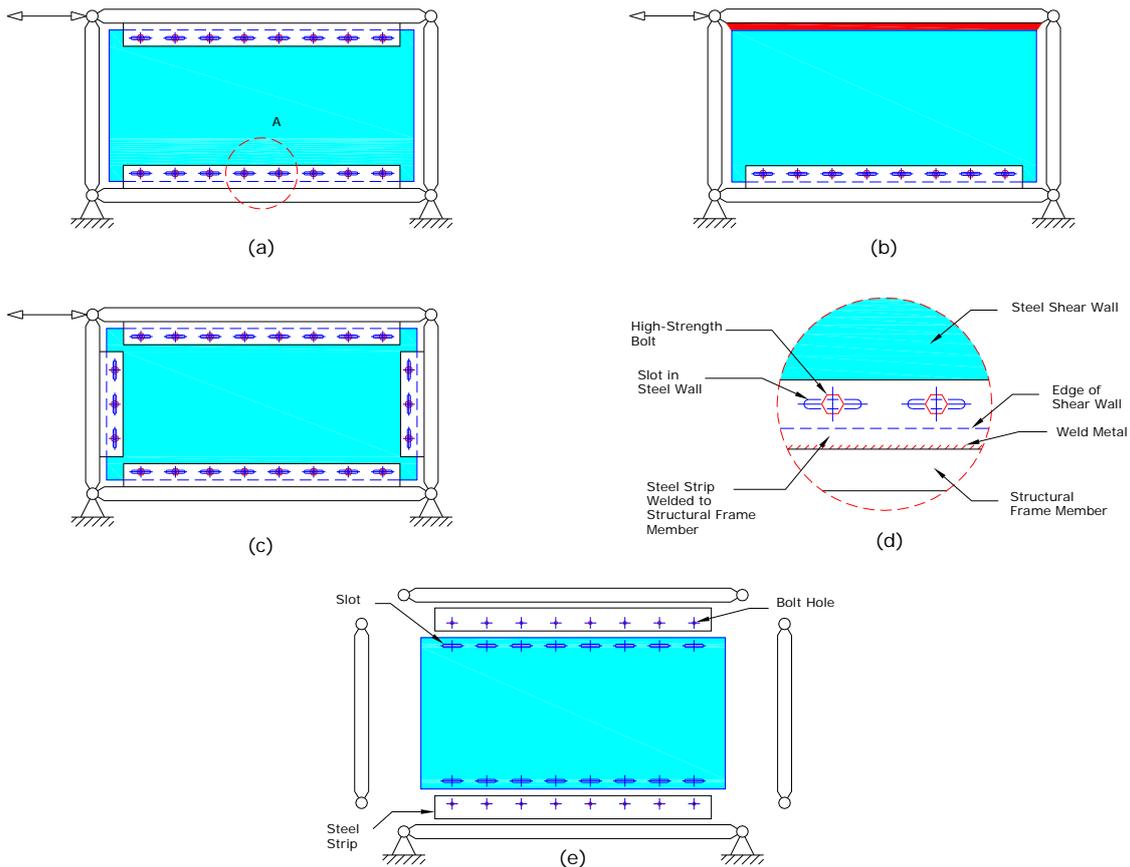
Real systems demonstrating the use of Frictional Mechanism (FM) for connecting steel shear walls to steel frames. a) The application of the FM for connecting the wall to the beams with no interaction between the wall and columns; b) the application of the FM for connecting the wall to one beam while the other beam is welded to the wall, with no interaction with columns; c) The use of FM for connecting the wall to all surrounding frame members; d) Detail A showing the method of connecting the FM to the steel shear wall and the adjacent frame member through an additional strip of steel which is bolted to the slotted wall; e) exploded view of the system shown in (a).
